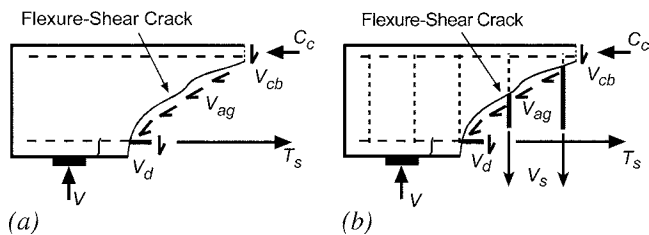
Sectional model for force transfer at flexure-shear cracks: (a) members without stirrups; and (b) members with stirrups.
